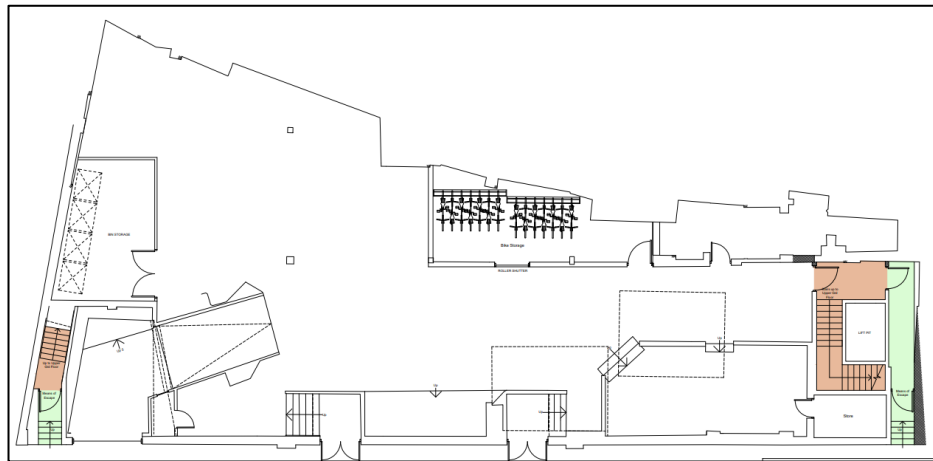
proposed lower ground floor plan allowing for potential ingress by floodwaters
